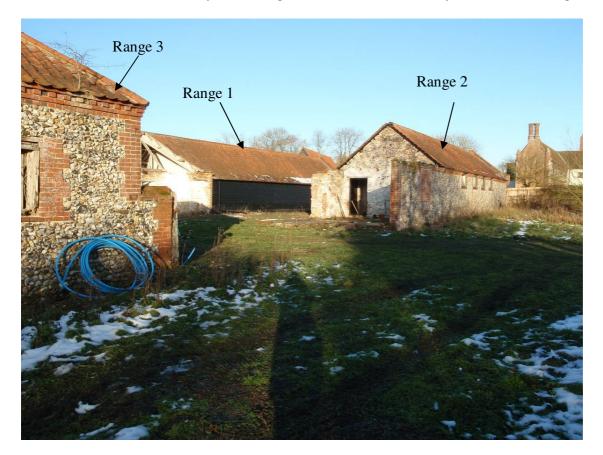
General view of surveyed buildings, Range 3 at left, Ranges 1 & 2 at centre, and Abbey Farm in background, looking northeast
